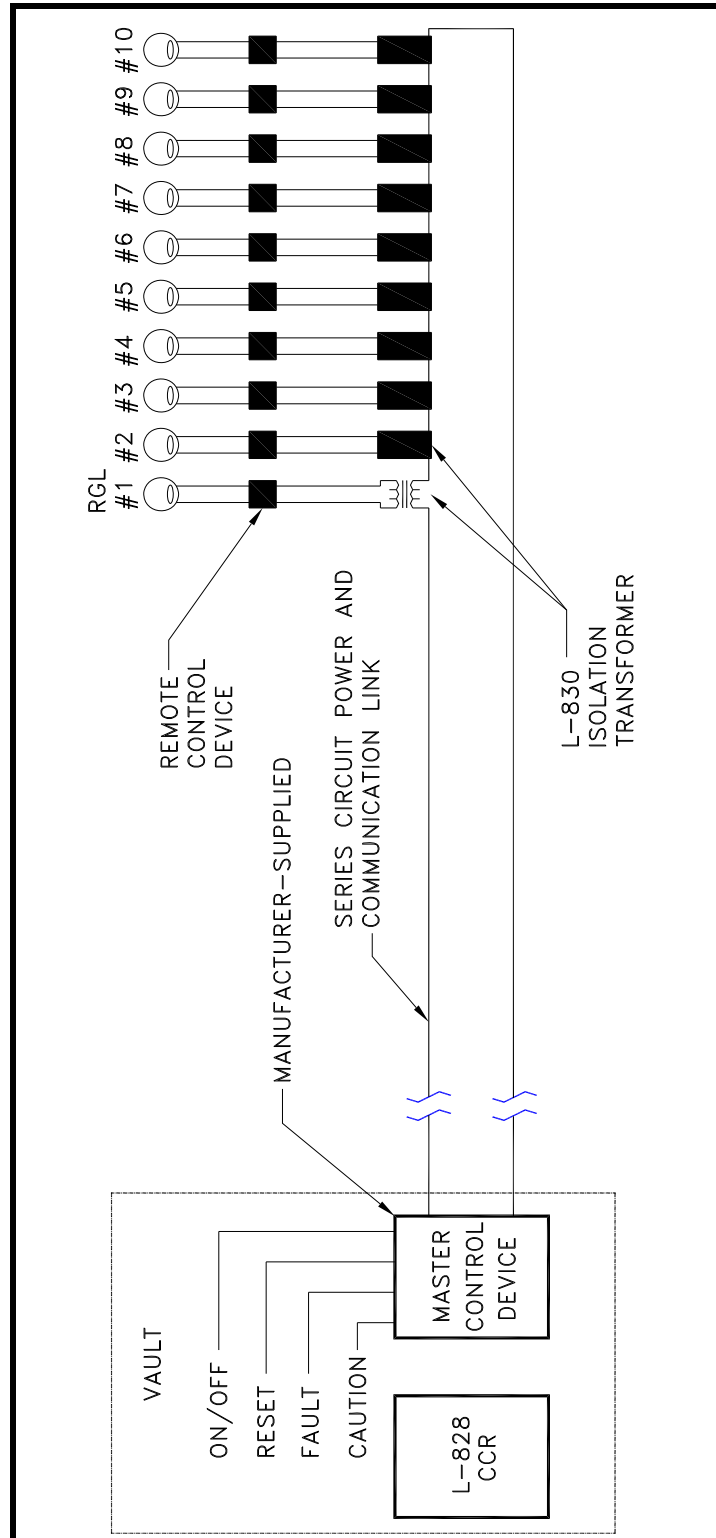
Typical In-Pavement RGL External Wiring Diagram – Power Line Carrier Communication, One Light Per Remote.
